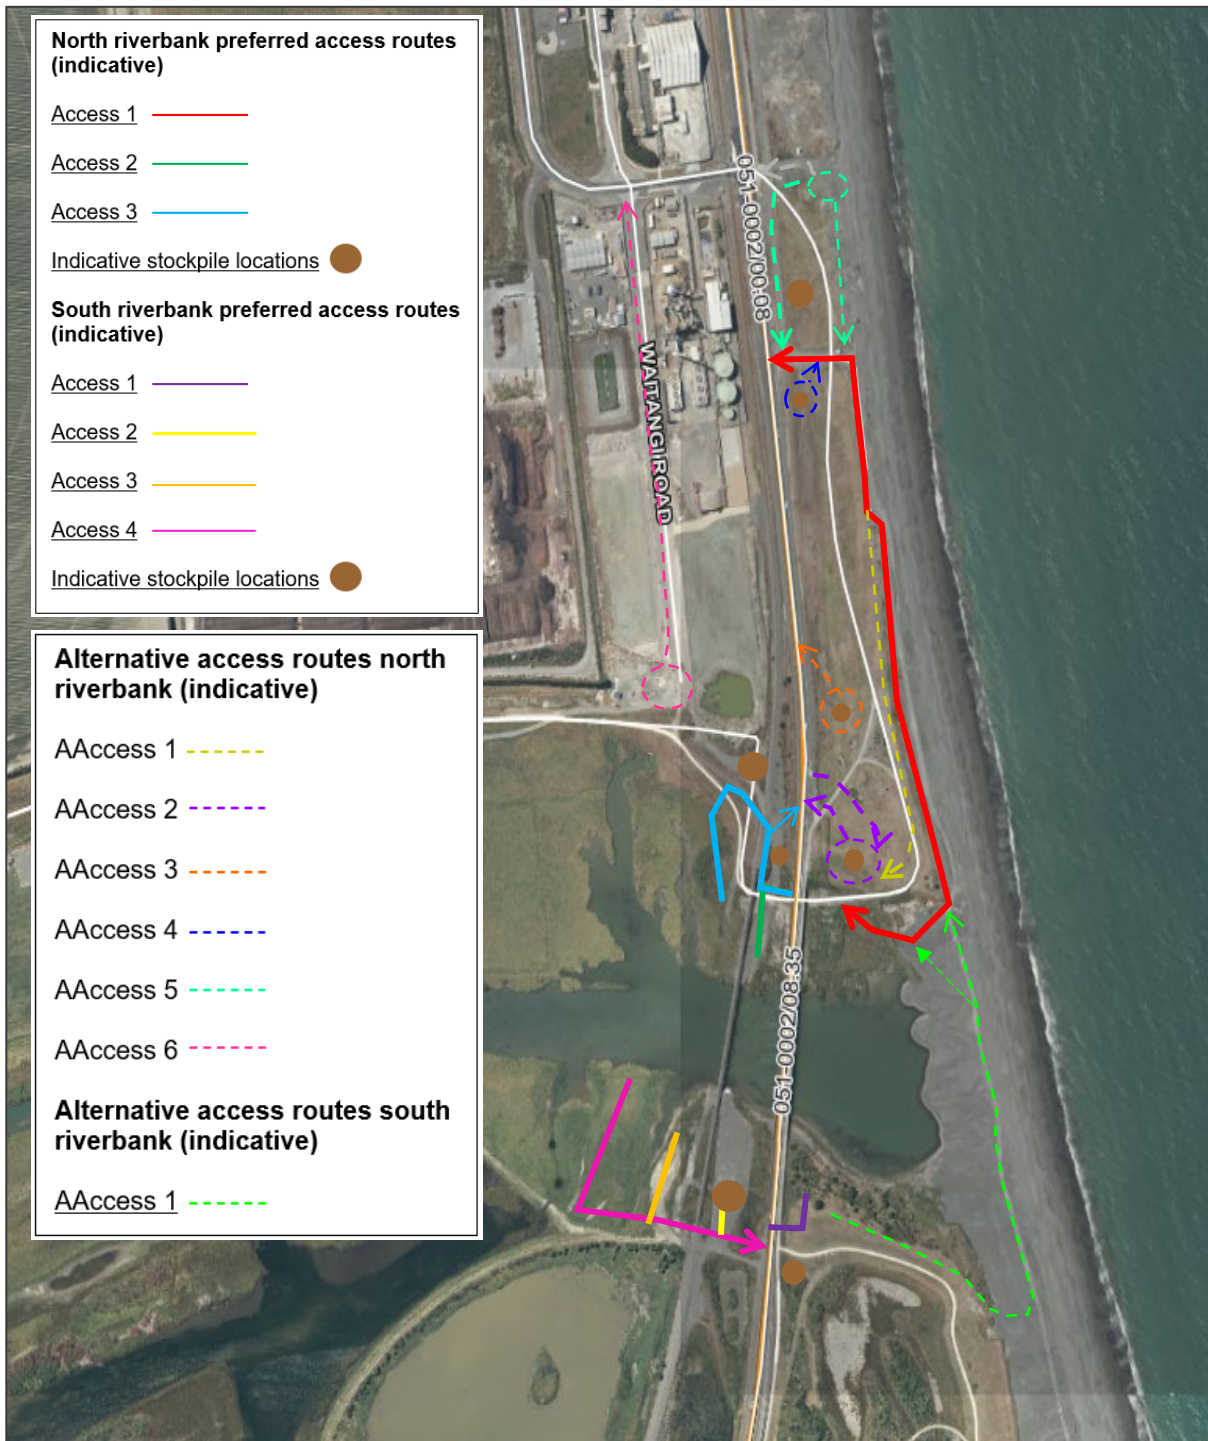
Proposed site access and stockpile locations (Source: TREC)
